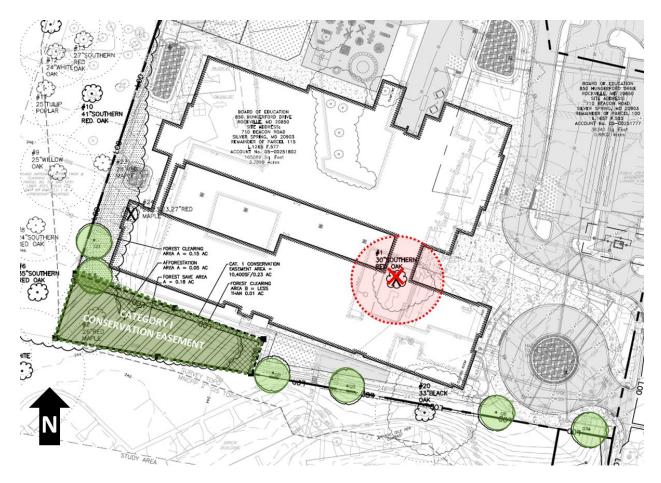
Proposed Specimen Tree Removal and Mitigation Planting
